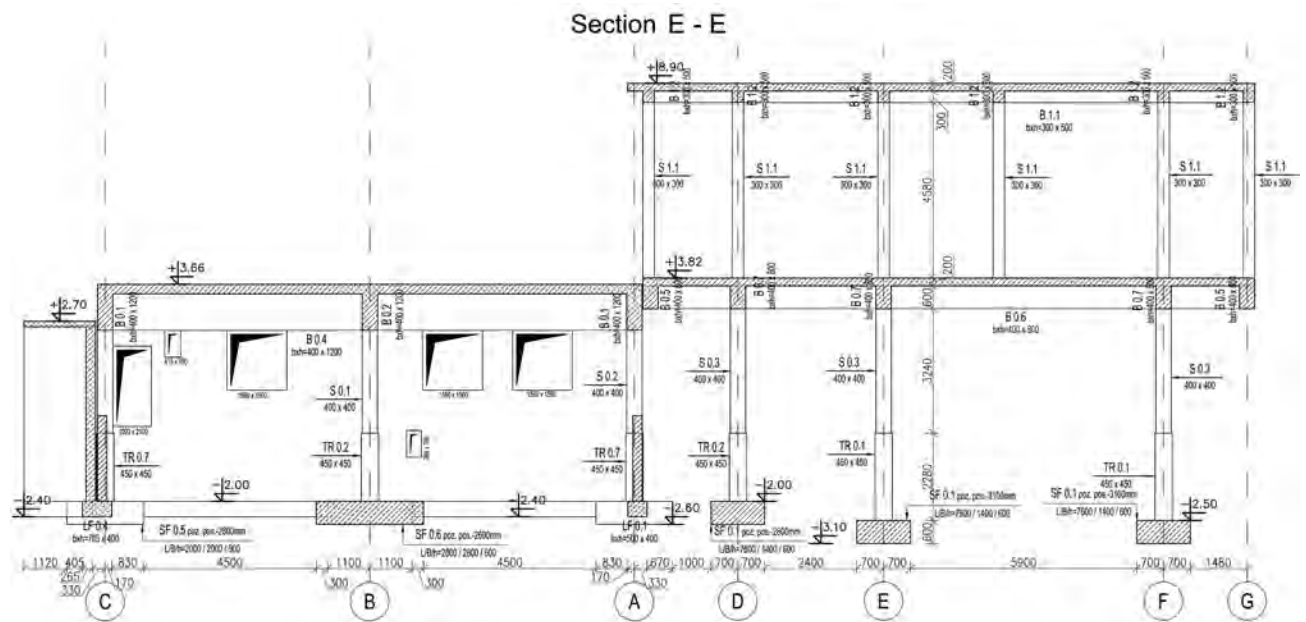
Cross-section assembly drawing of the parts of a reinforced concrete building [8]
